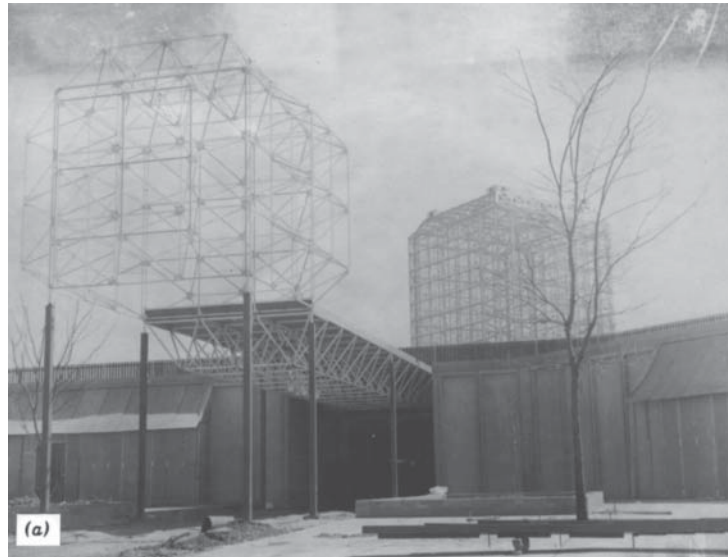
Cold-formed steel sections used in space frames. Courtesy of Unistrut Corporation.
